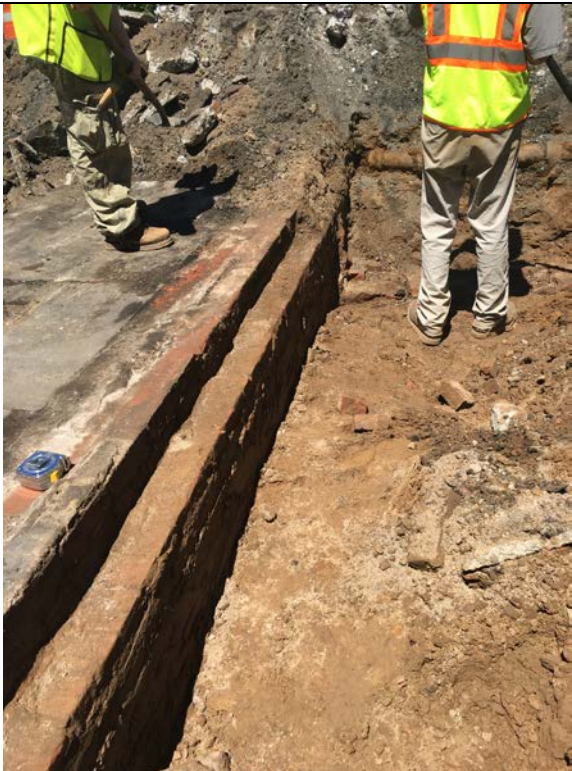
Red brick wall abutting northern wall of feature identified in Trench 2. Photo taken June 20, 2017.
